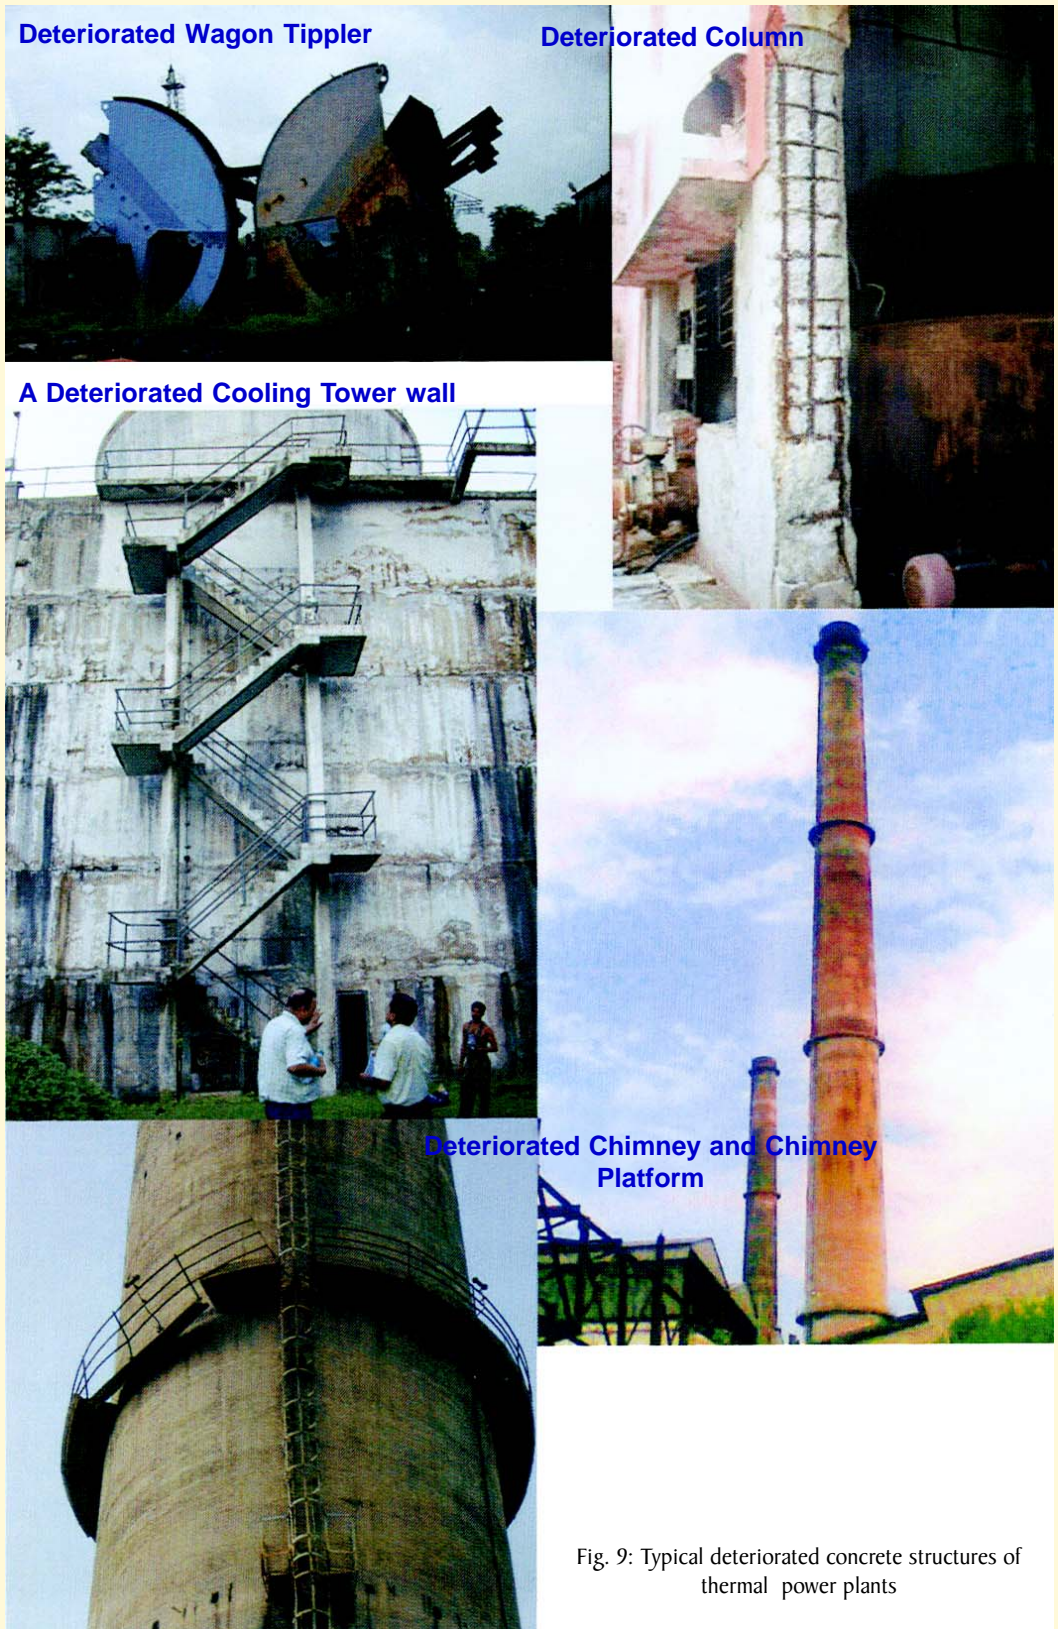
Typical deteriorated concrete structures of thermal power plants
